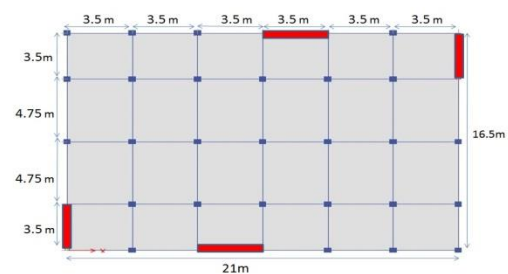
Plan of the building model with 0.5% shear wall ratio in each direction
